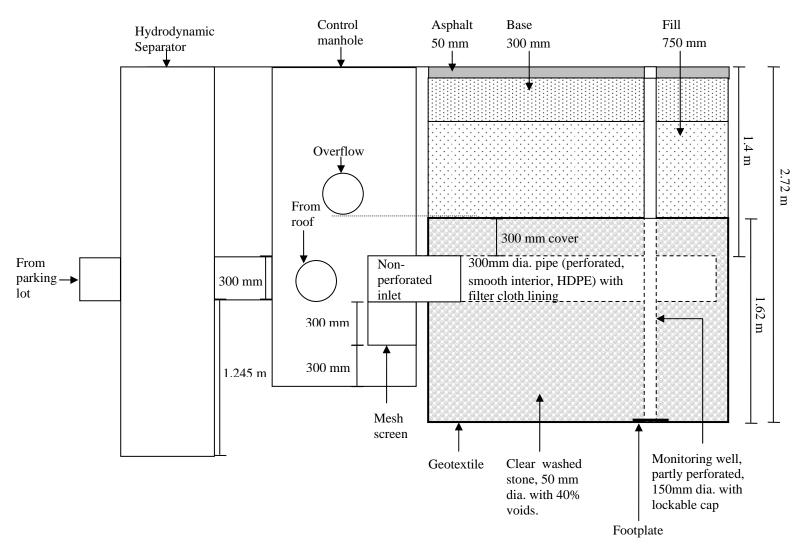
Cross section of the infiltration trench receiving road (1500 m²) and roof runoff (500 m²)
